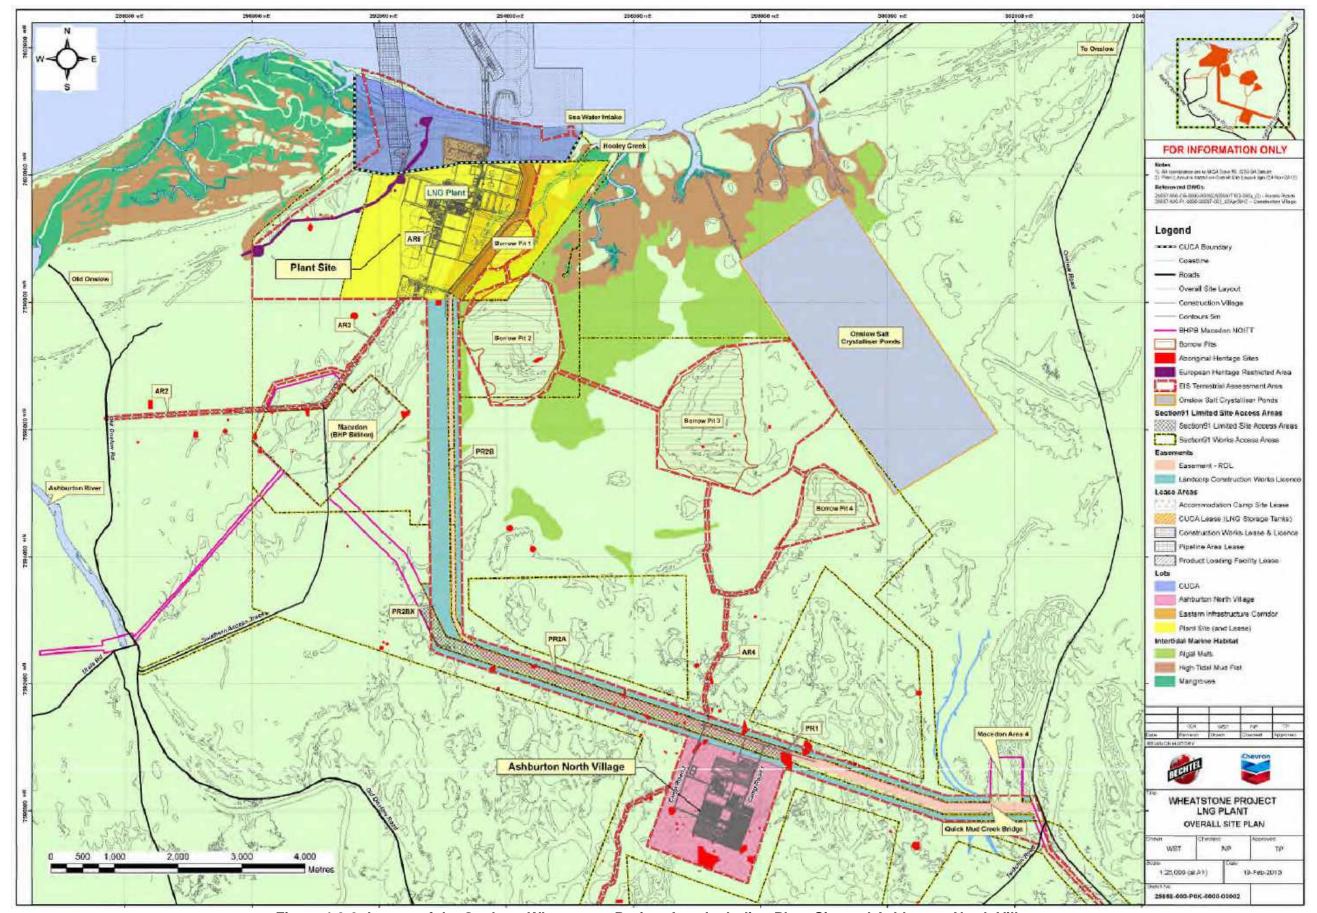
Layout of the Onshore Wheatstone Project Area Including Plant Site and Ashburton North Village
